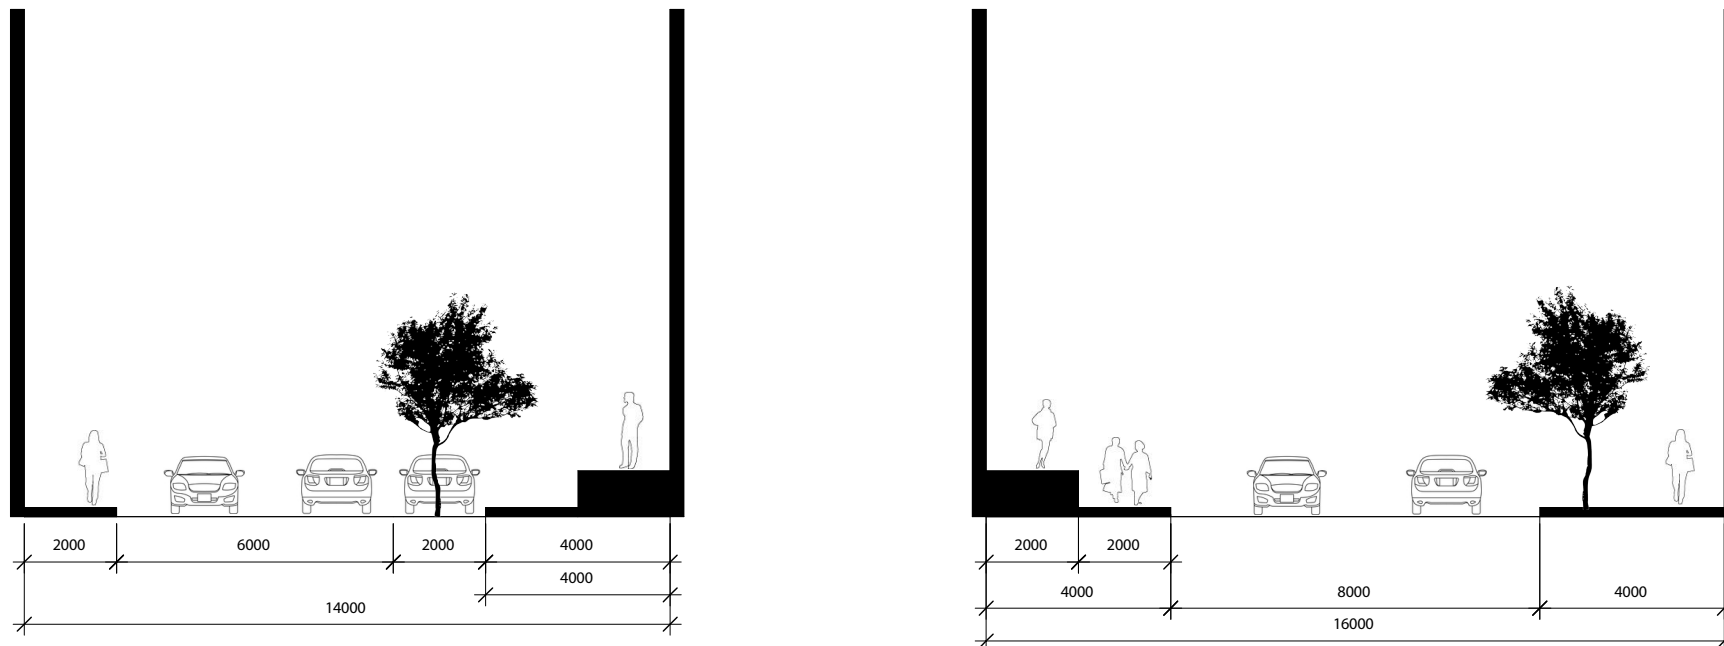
Street section based on standards according to Bodin et al. (2015). Left picture is the north side of new buildings, the right picture is Södra Hamnleden. This is not an actual section of the street, it is the widest the street gets and it shows how all the functions would fit in that scenario.
